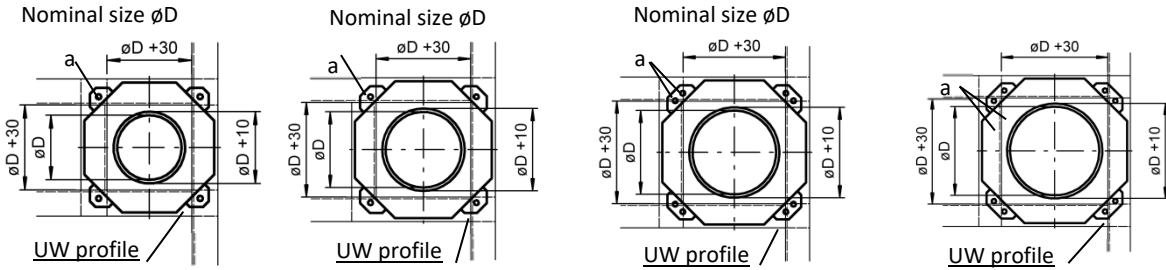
Dry installation on lightweight partition wall with mounting frame AR
